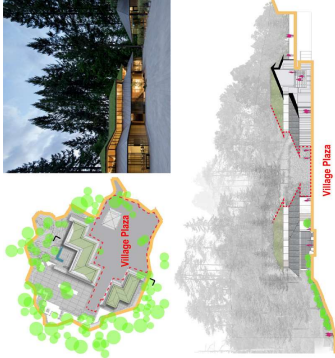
Portland Japanese Garden Cultural Village follows the natural terrain and landscape horizontally (top left) and vertically (bottom). (Source: Author, based on architecturemaxime.com.) Individual buildings in group form to envelope a central village plaza (top right). (Source: Photo by kkaa.com.)
